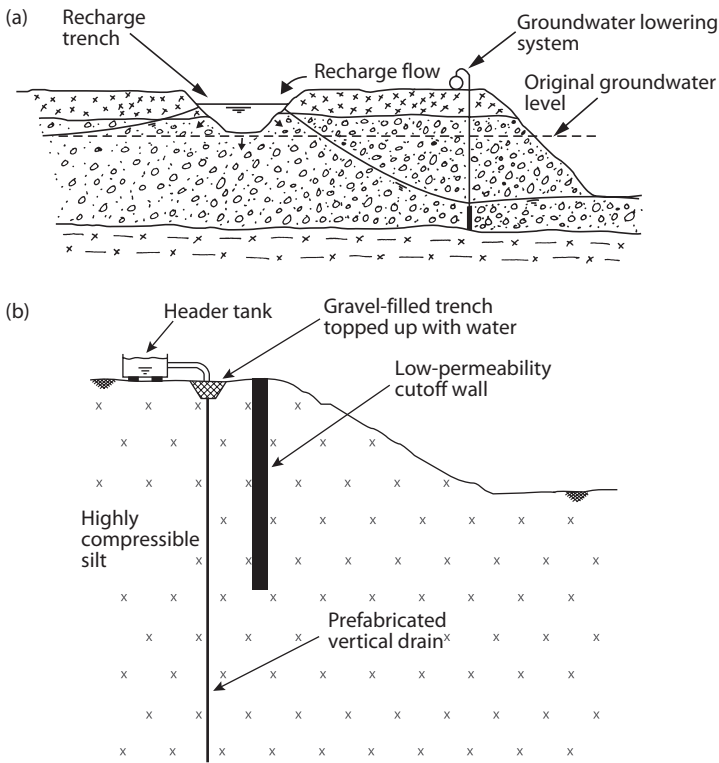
Recharge trench. (a) Recharge trench in unconfined aquifer. (b) Recharge trench used in combination with prefabricated vertical drains. (Based on Ervin, M.C., and Morgan, J.R., *Canadian Geotechnical Journal*, 38, 732–740, 2001.)
